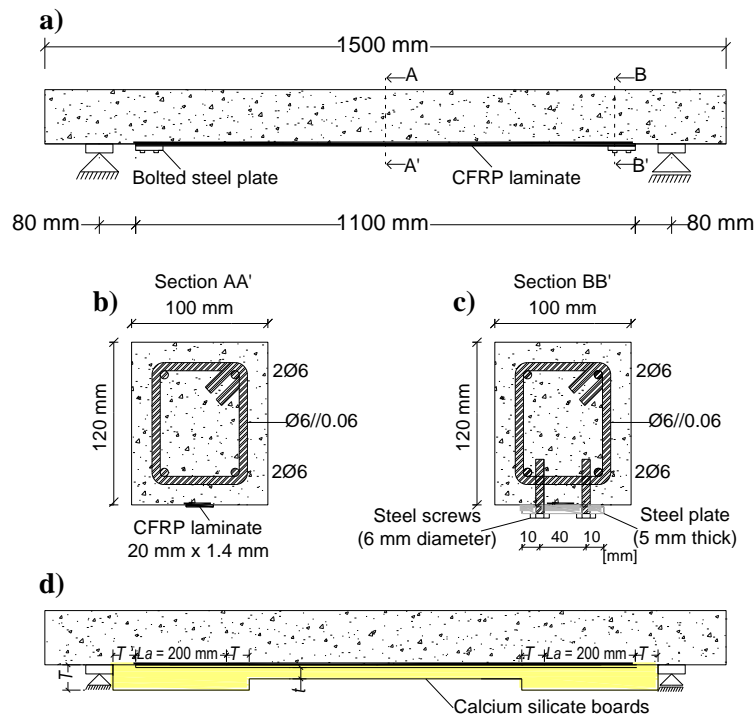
Geometry of the EBR-strengthened beams: a) longitudinal view of the specimen with mechanical anchorages on the CFRP strip extremities; b) current cross section; c) cross section with mechanical anchorage; d) longitudinal geometry of the fire protection system.
